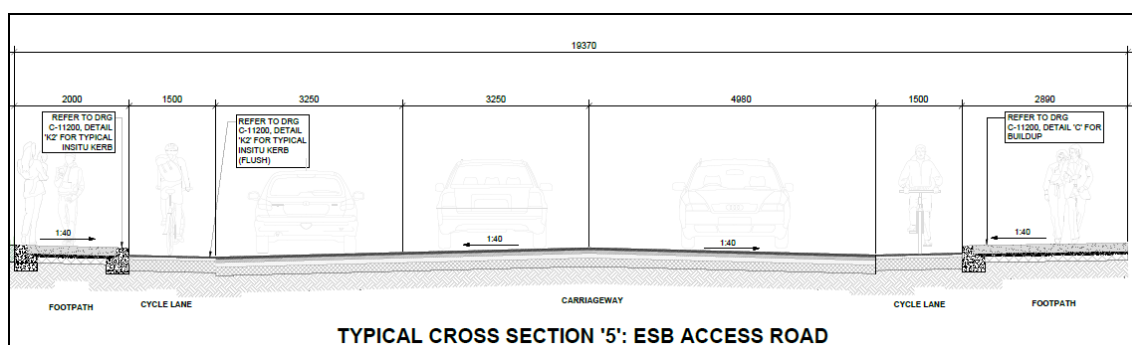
Proposed Cross Section 5 – ESB Access Road (Source: BMCE)
